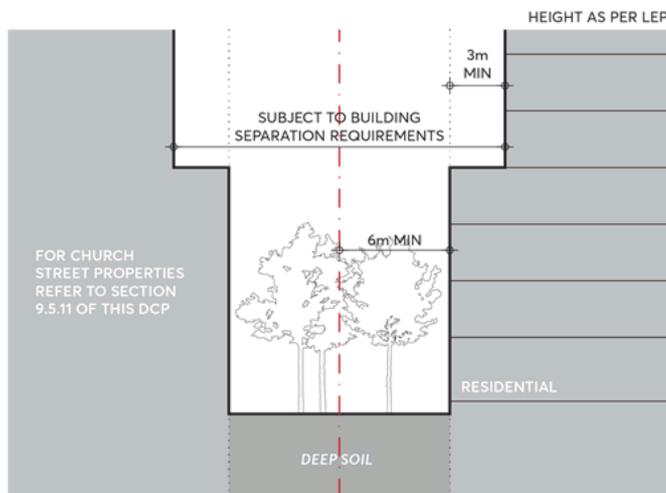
Setbacks and separation with properties fronting Church Street (site 05, site 06, site 09, and site 10)
